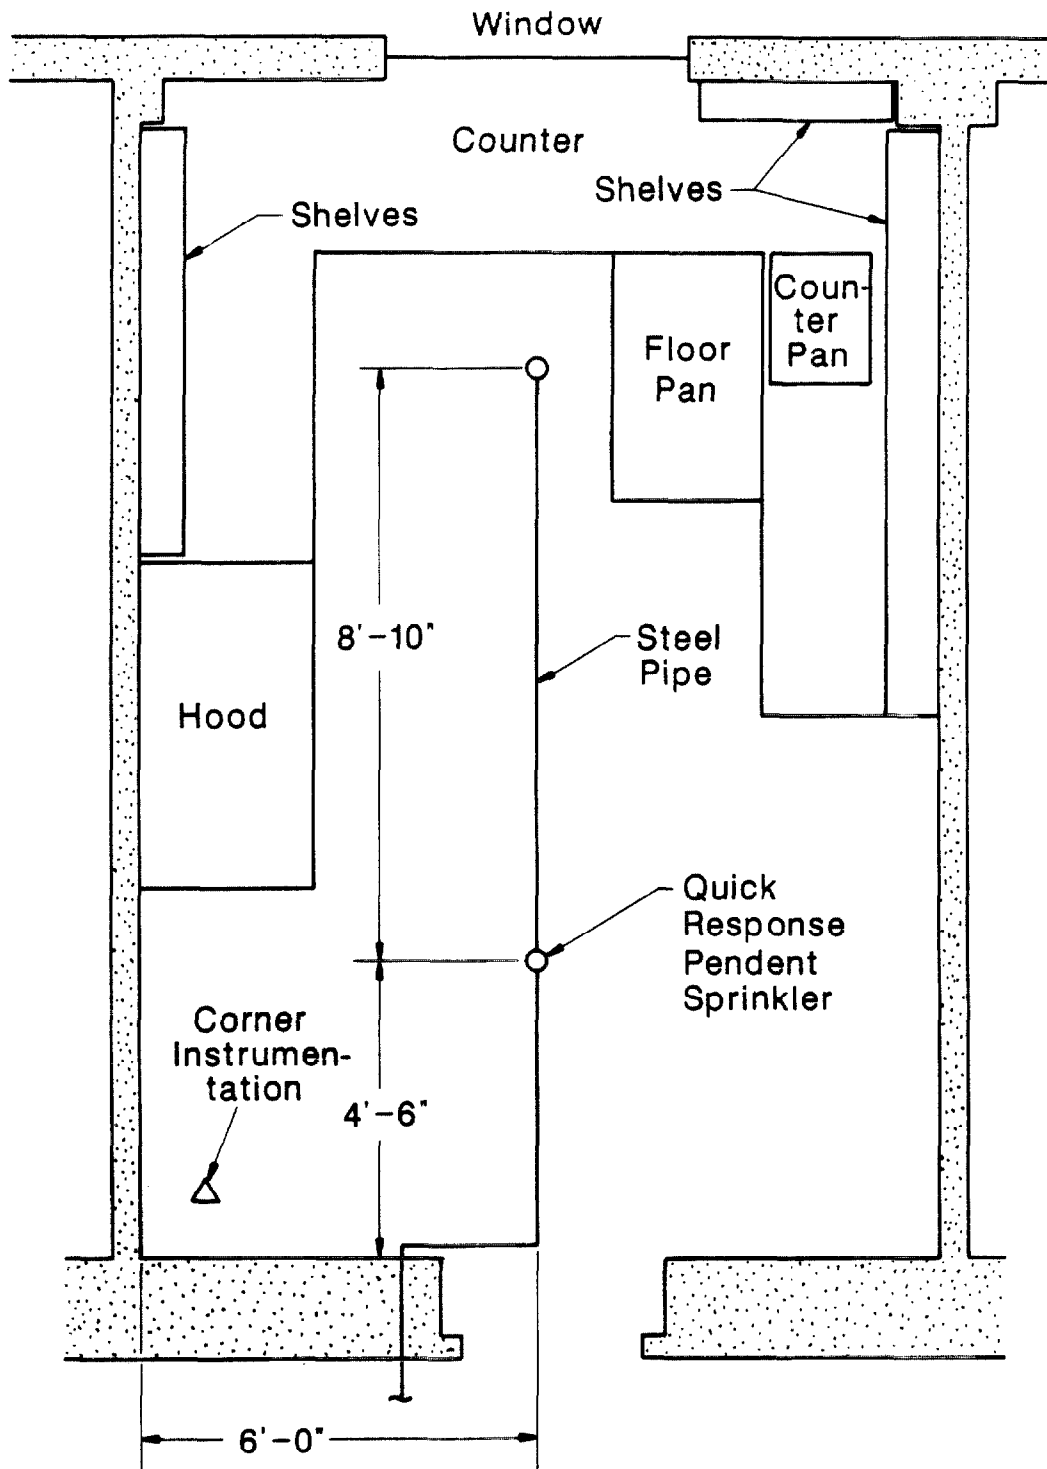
Laboratory plan for test with quick response pendent sprinkler, steel piping
